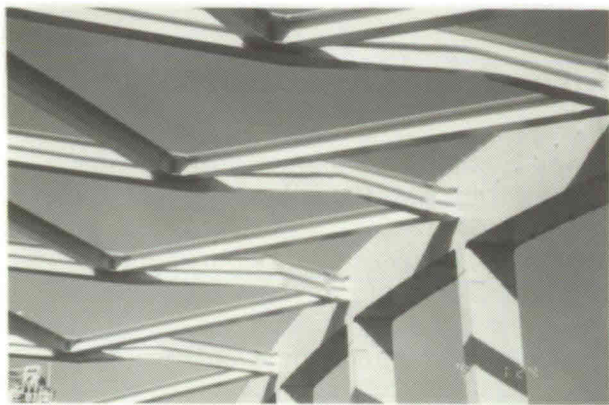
Buckled upper lateral horizontal and diagonal steel channel members (Bayshore Route, Rokko Island Bridge)
